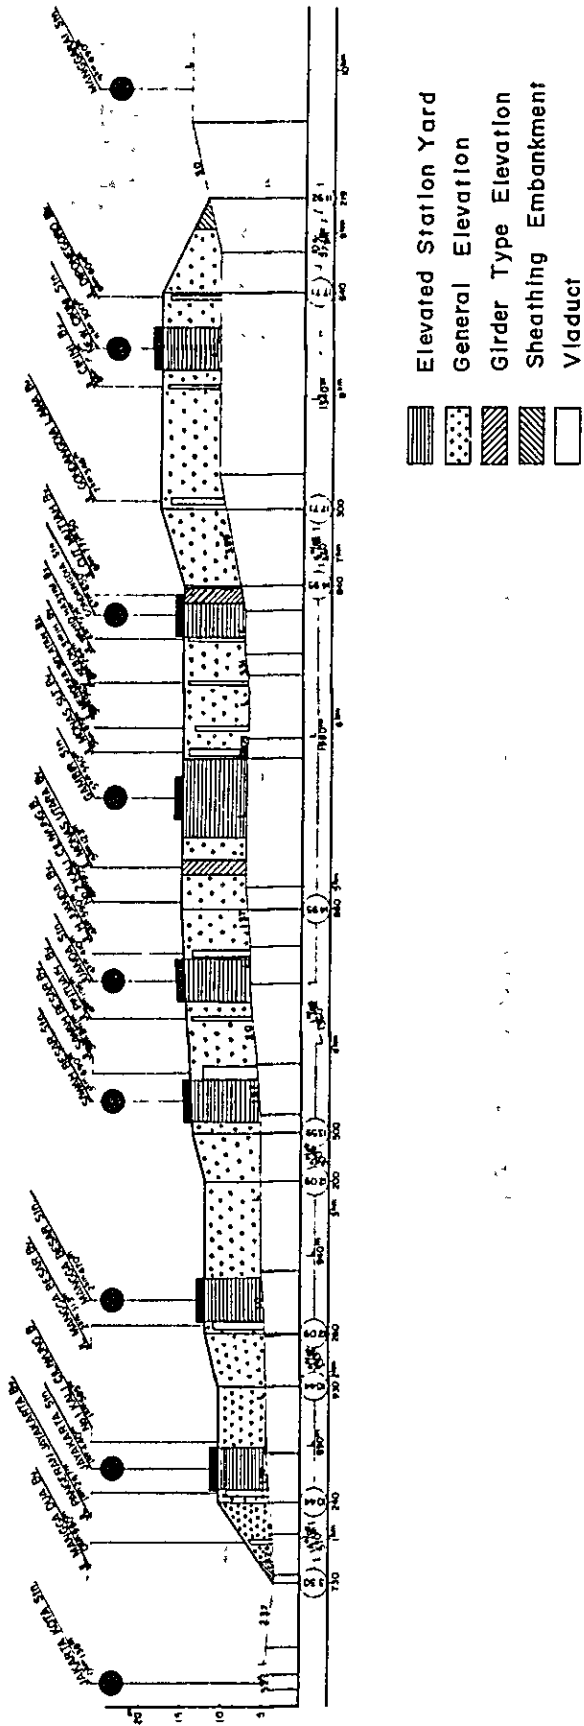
Kinds of Structure for Elevated Tracks
